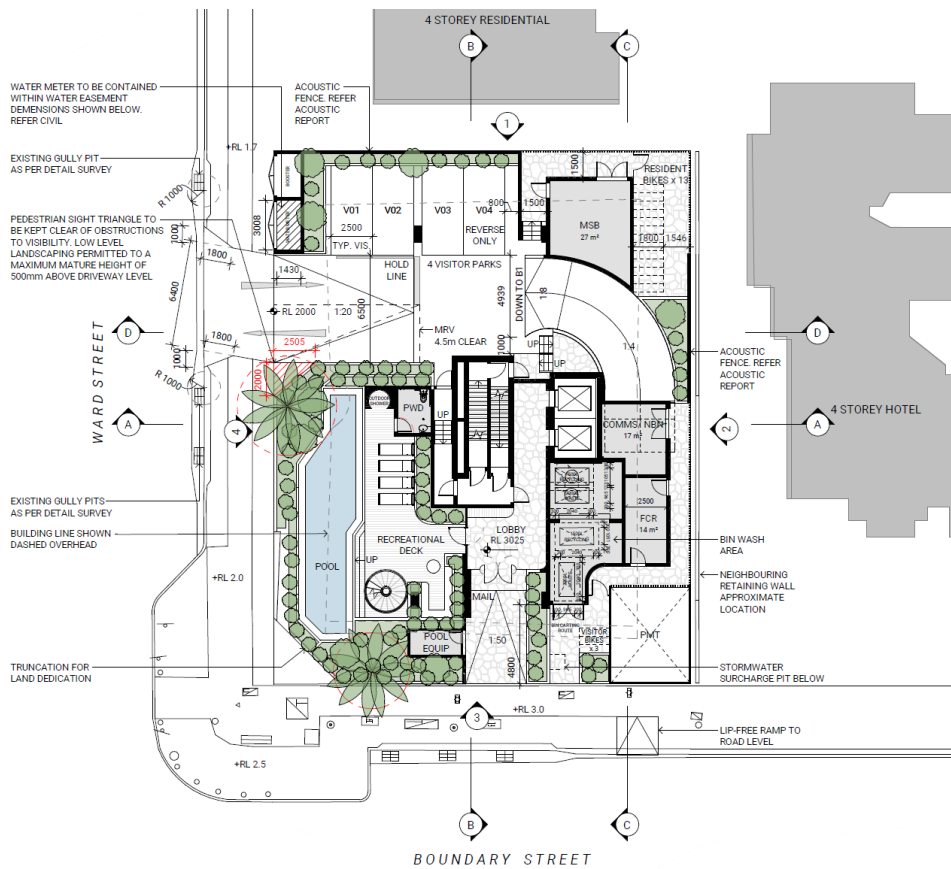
Proposed Ground Floor Plan (Source: Plus Architecture)
